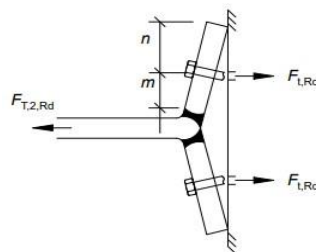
Bolt failure with flange yielding (SCI P398)
